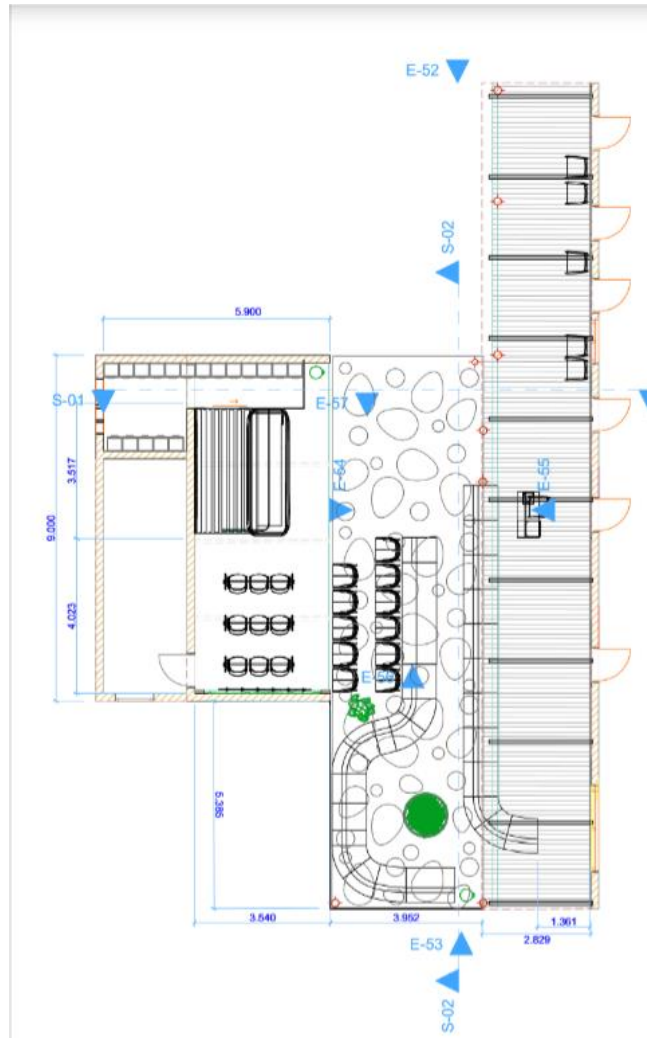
proposed queuing area layout (source, author 2020)
